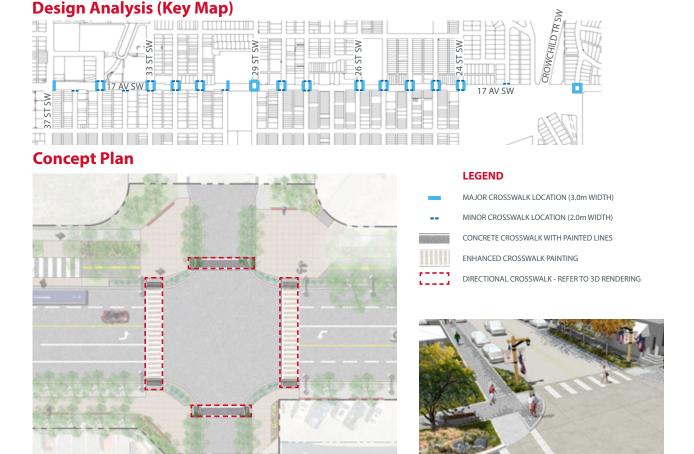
Directional Crosswalks and Wheel Chair Ramps Concept Plan
